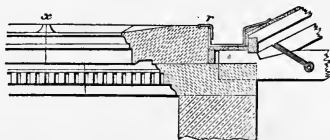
Stone Cornice. Sectional Elevation showing Saddled Joint at x.
